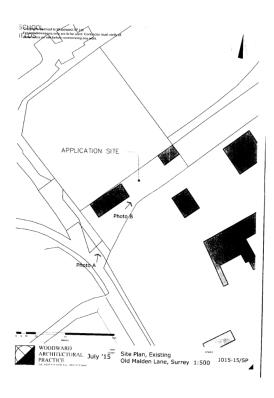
Site Layout Plan (ref. 15/16658/PNO)
